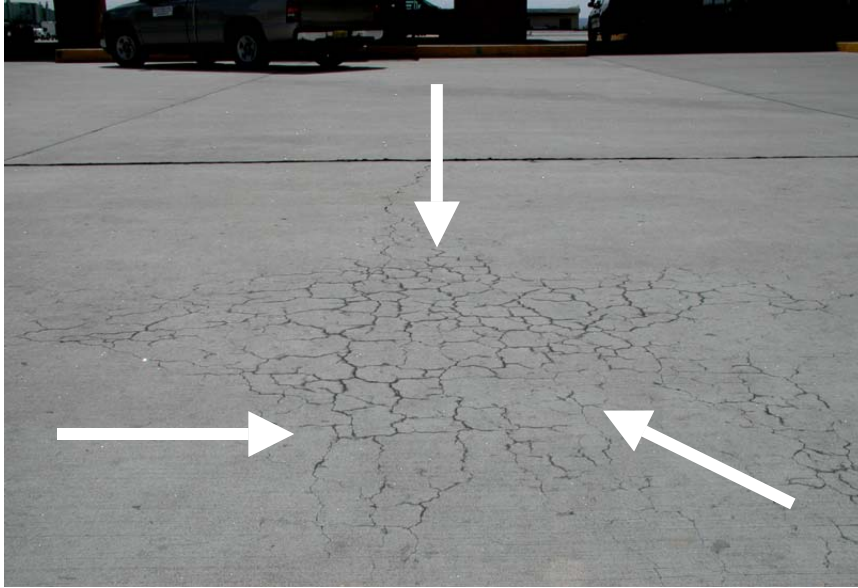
Cracks (→) in the central part of a pavement section.
